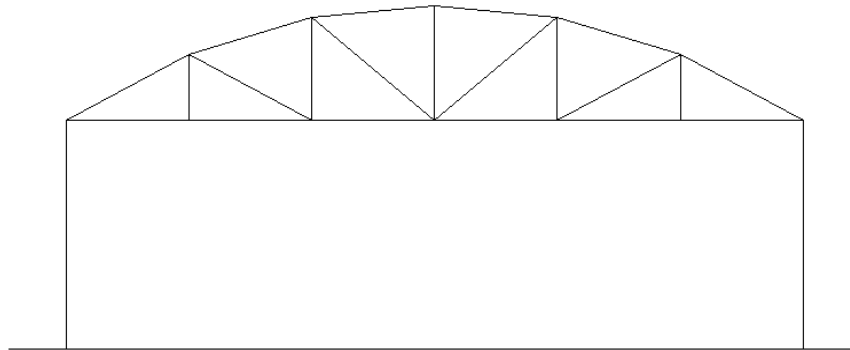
Another Modified Wood Truss Configuration with Top Chord Separated Into 6 Members
